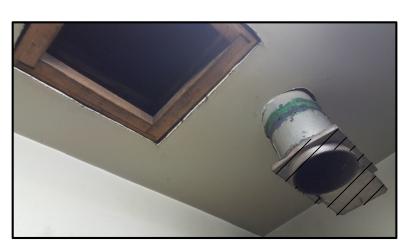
EXISTING BLADE DAMPER TO BE REMOVED — WELDING ROOM 108.
